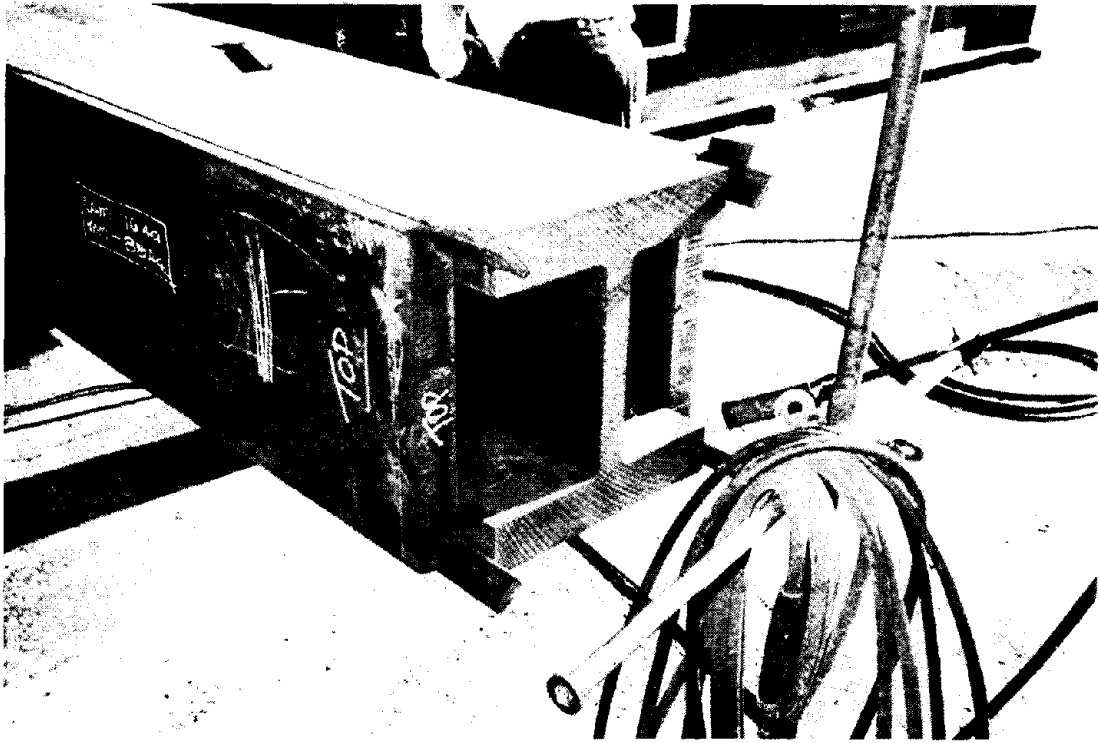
Plated Box-Column Typical of Modern Steel Construction
